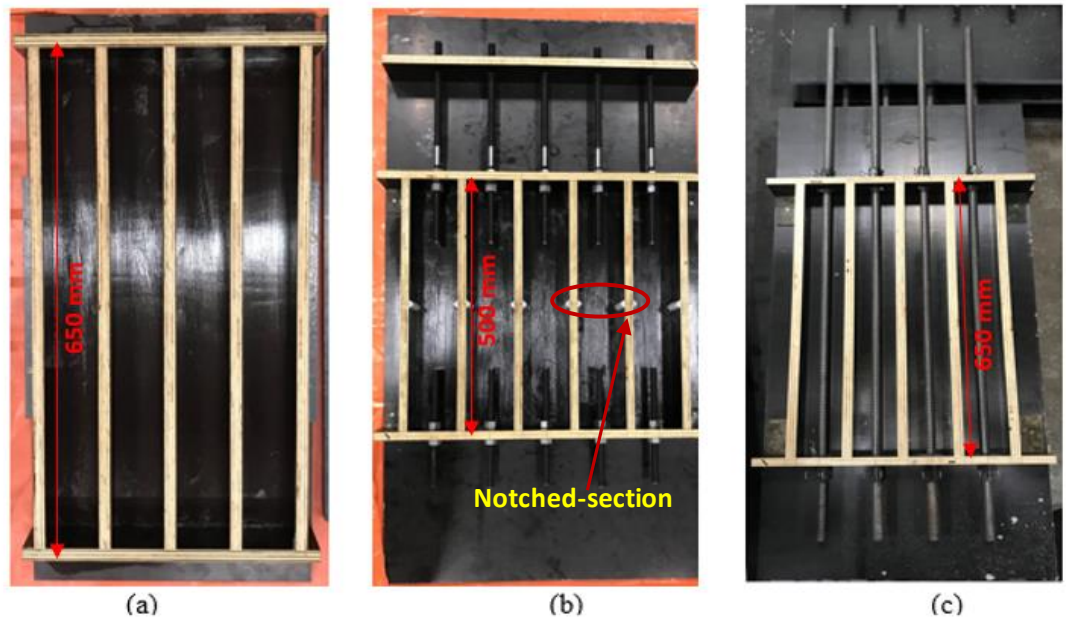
Different types of moulds for (a) shrinkage test specimen (b) direct tension test specimen and (c) tension stiffening test specimen.
